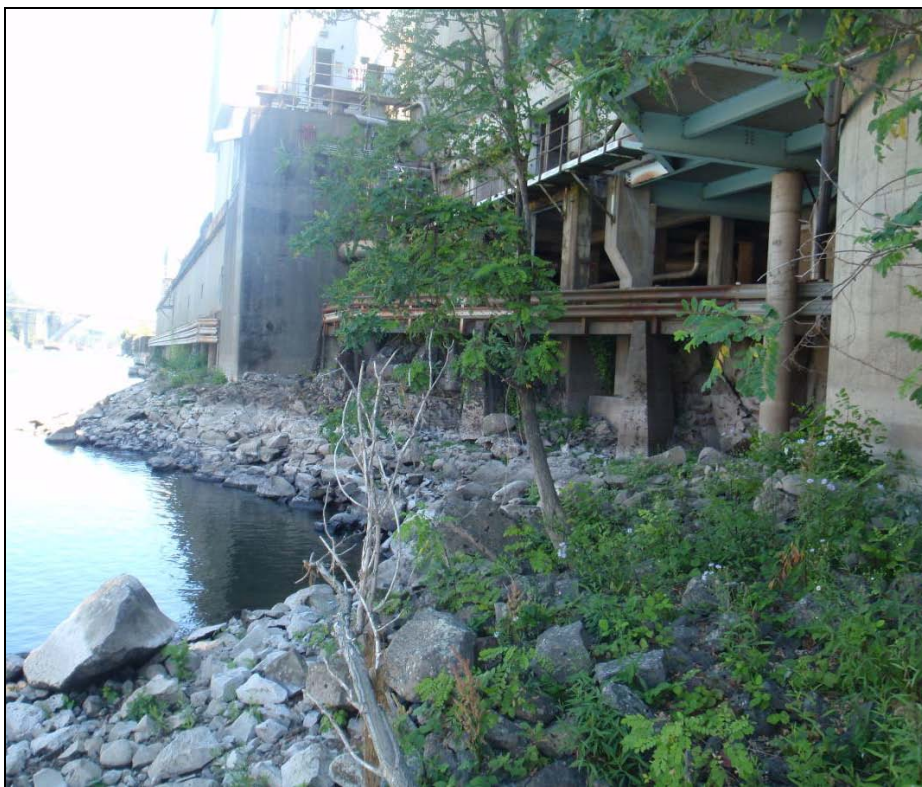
Shoreline showing pipe tunnel and associated buildings, looking downstream (08/03/2012).
